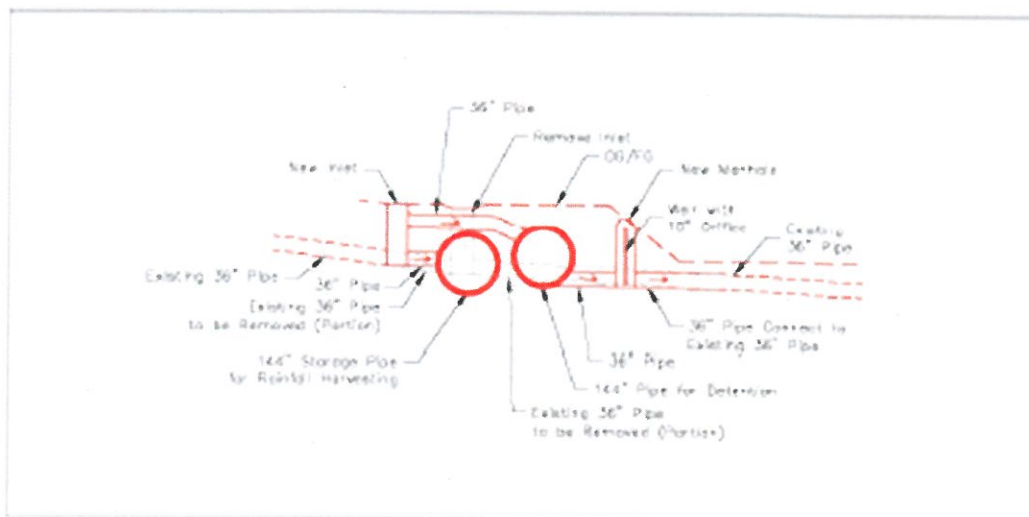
RAINFALL HARVEST SYSTEM CONCEPTUAL SECTION PLAN
